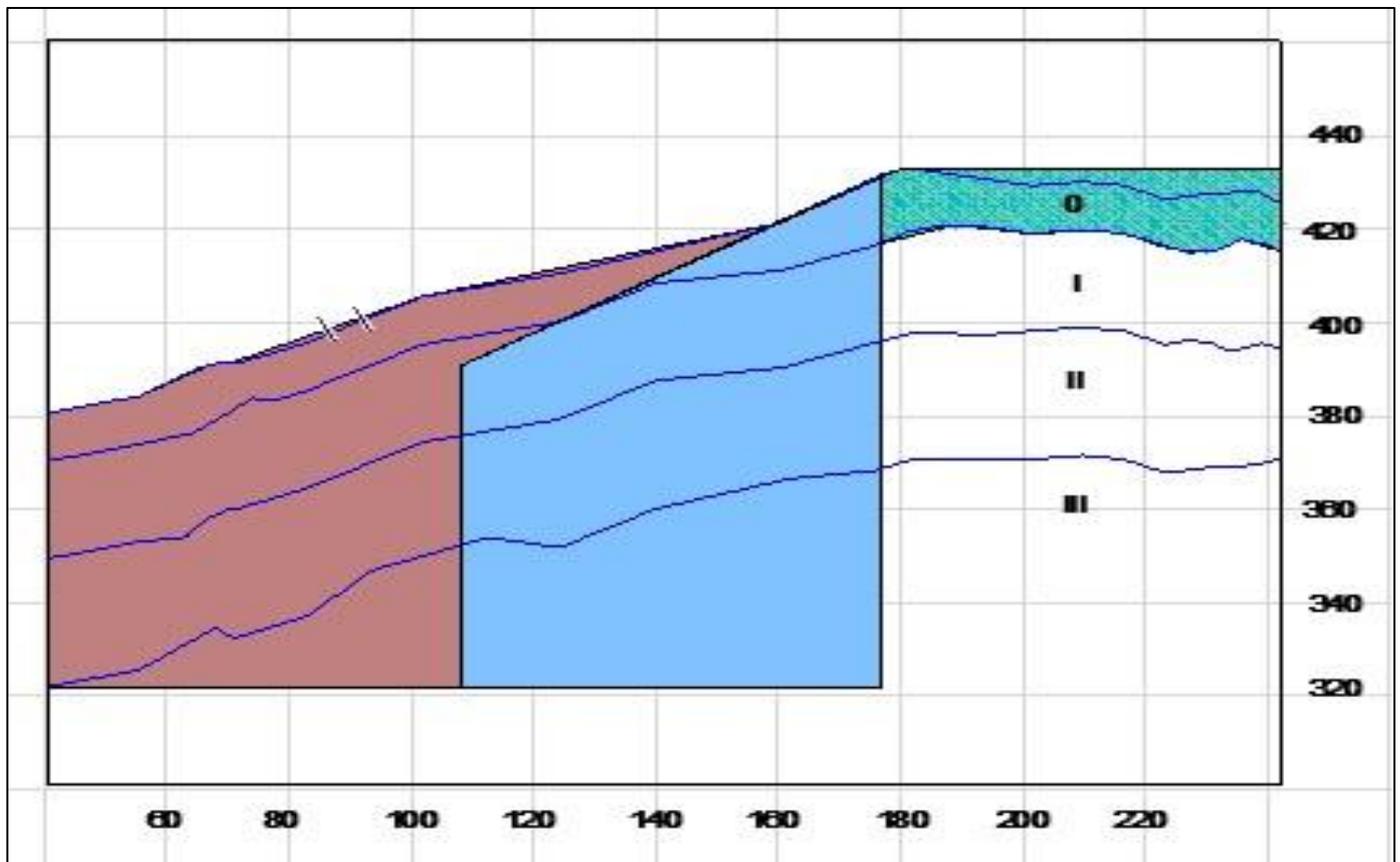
Location of Excavated Soil (Arch-Cad 2019)
